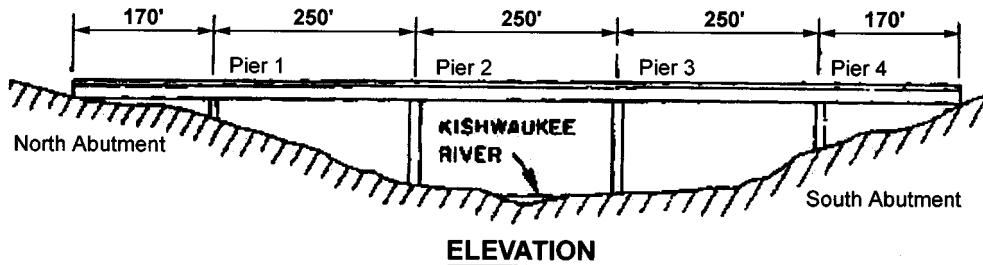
Longitudinal layout of Kishwaukee Bridge
